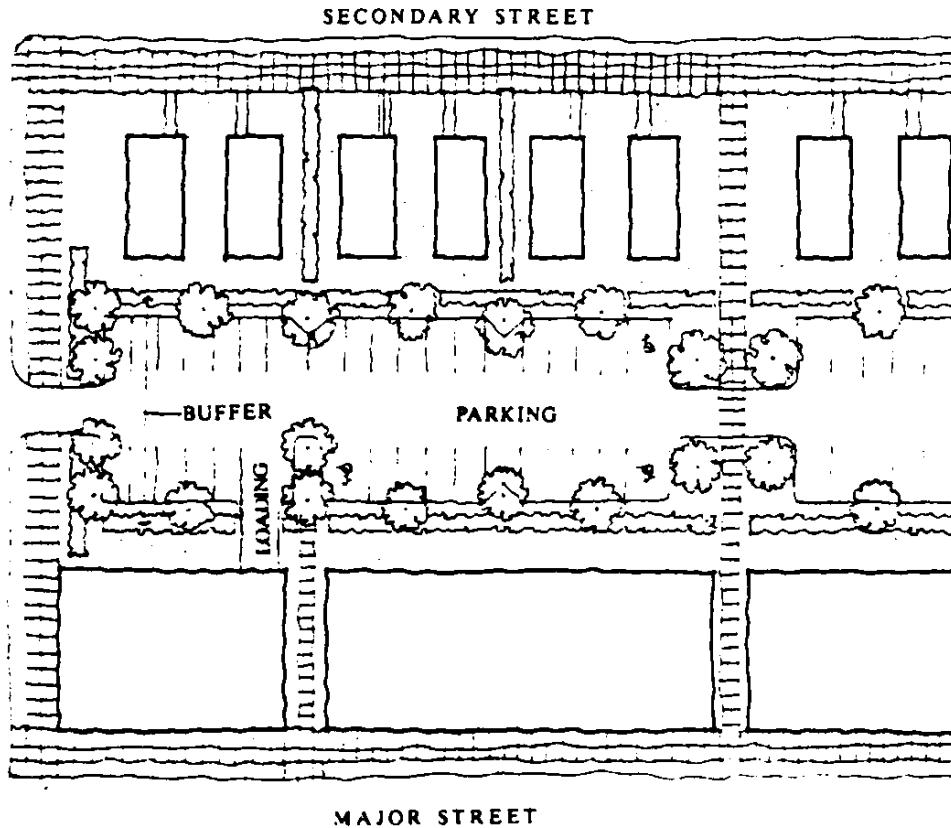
Loading and service areas should be located to the rear of buildings and be appropriately landscaped, buffered and screened.
